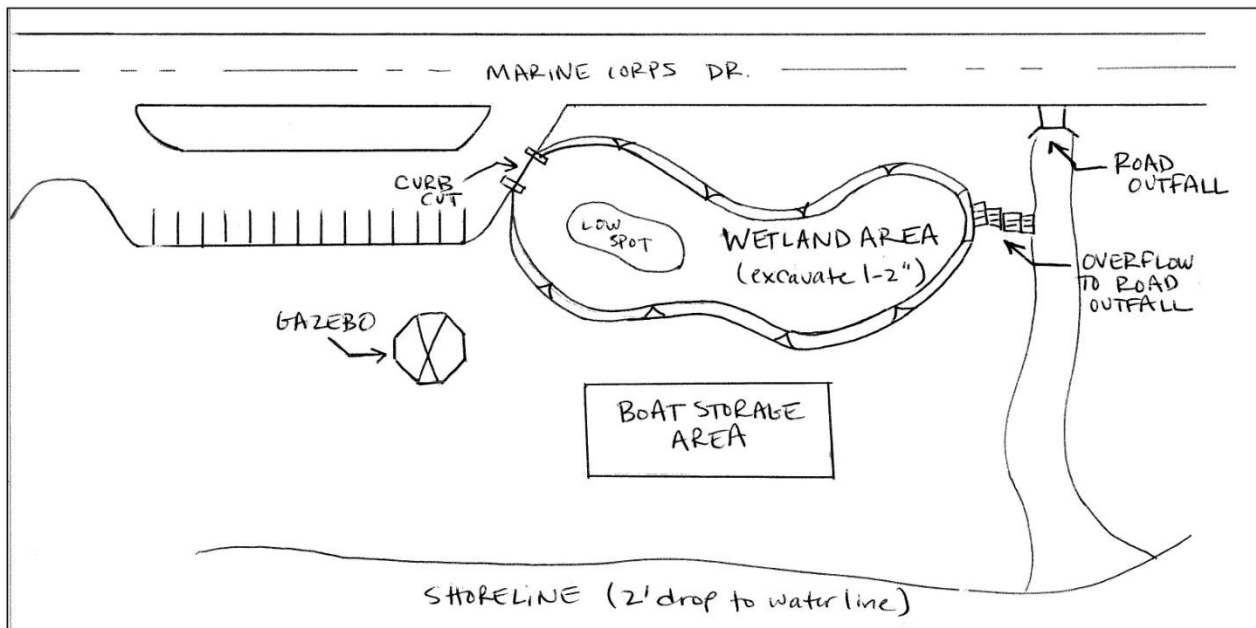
Plan view of proposed wetland area adjacent to the parking lot (conceptual – not to scale).
